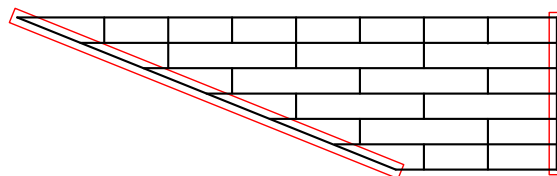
Beneficial Staggered Diaphragm or Cross-Frame Framing Arrangement for a Straight Bridge with Non-Parallel Skew
